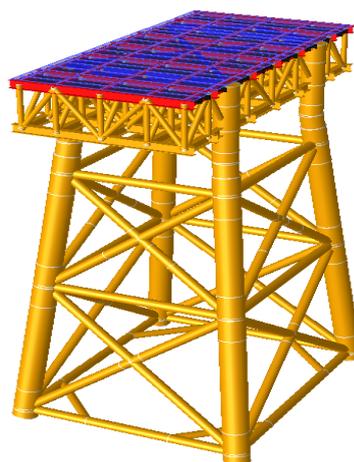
Mooring Dolphins / Walkways / Vent Stack Structural Jacket
